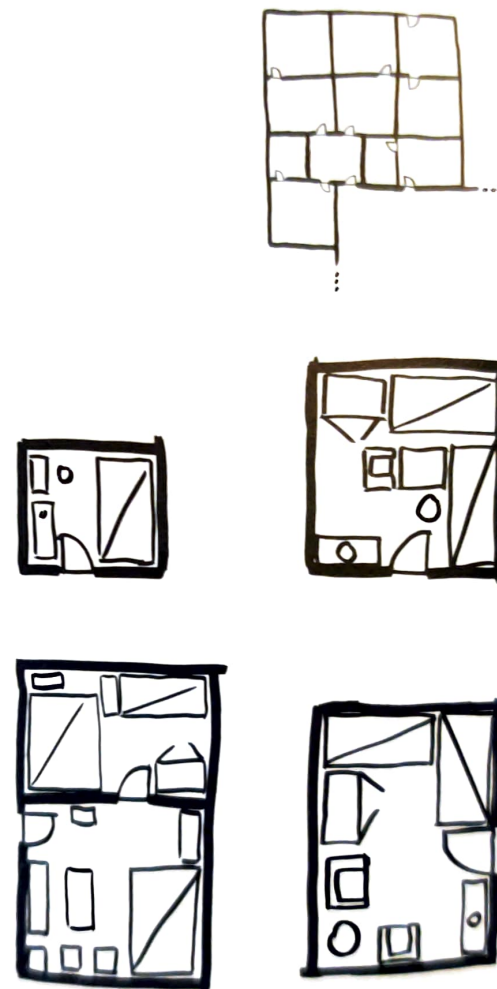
Floor plans of types of shacks for dwelling in Kibera
